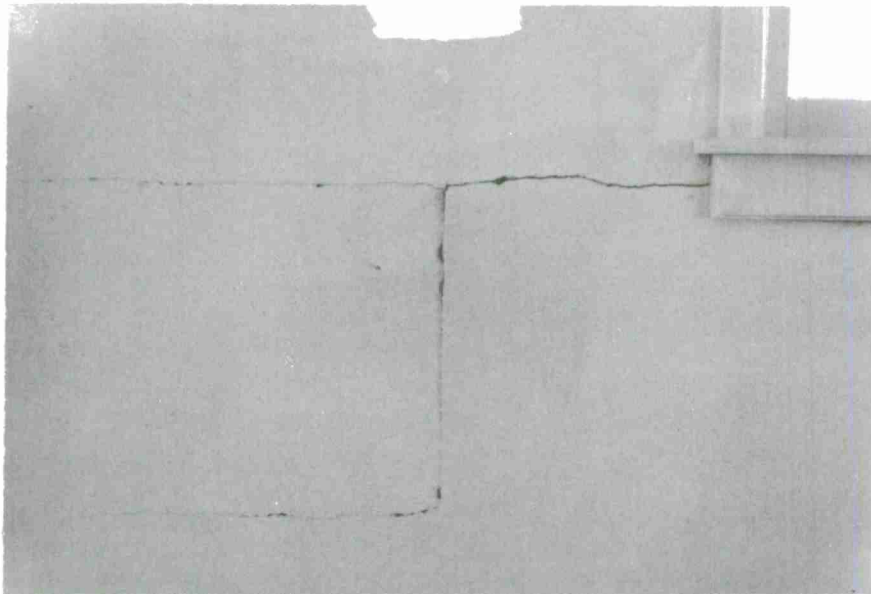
Pretest Plaster Cracks, North Bedroom, Front Window
